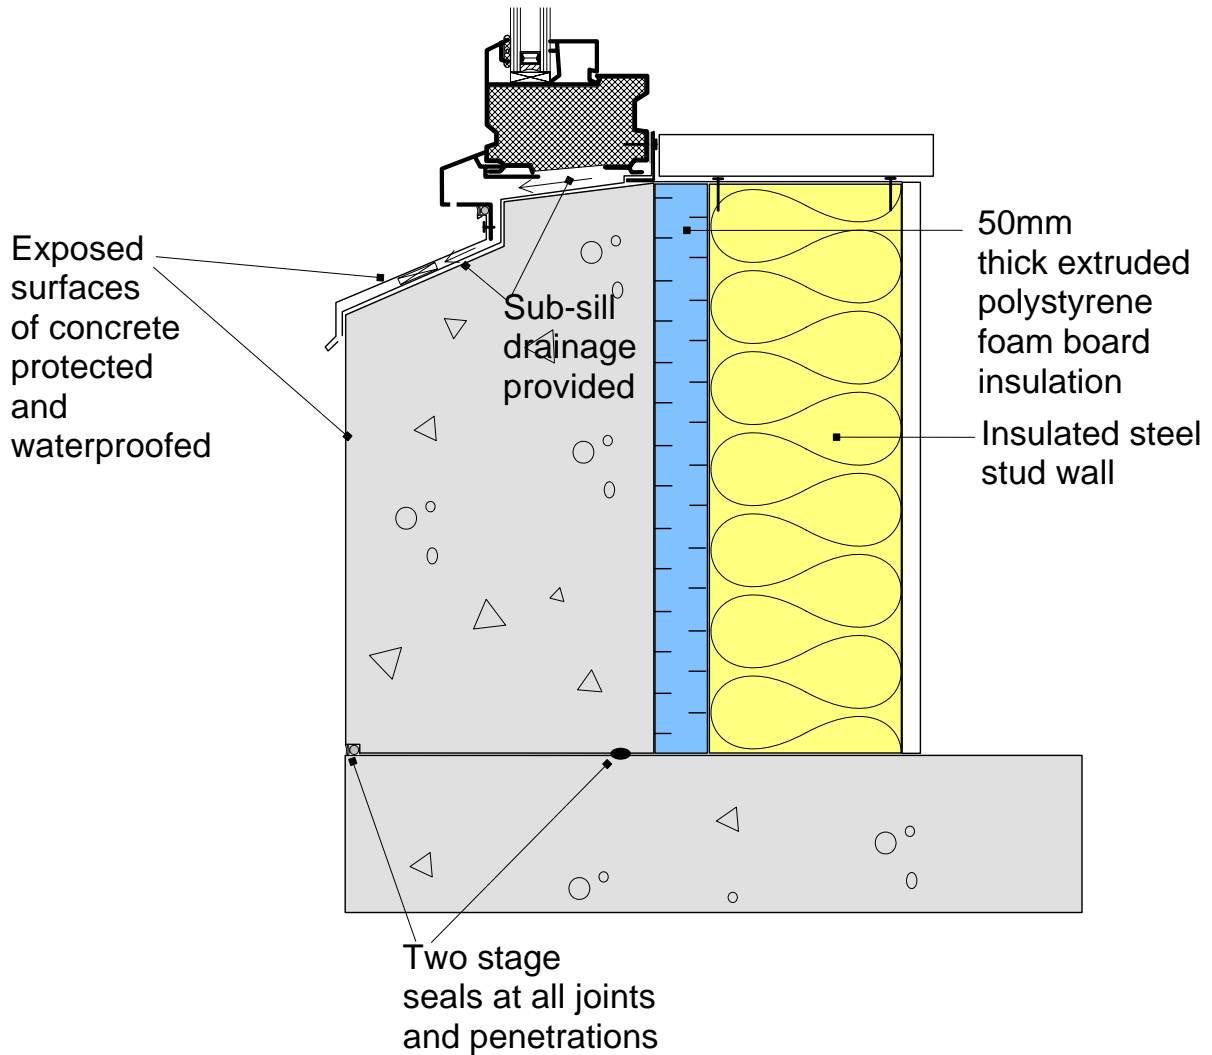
Glazing and wall assembly that enhances energy efficiency and durability of poured in place concrete walls
